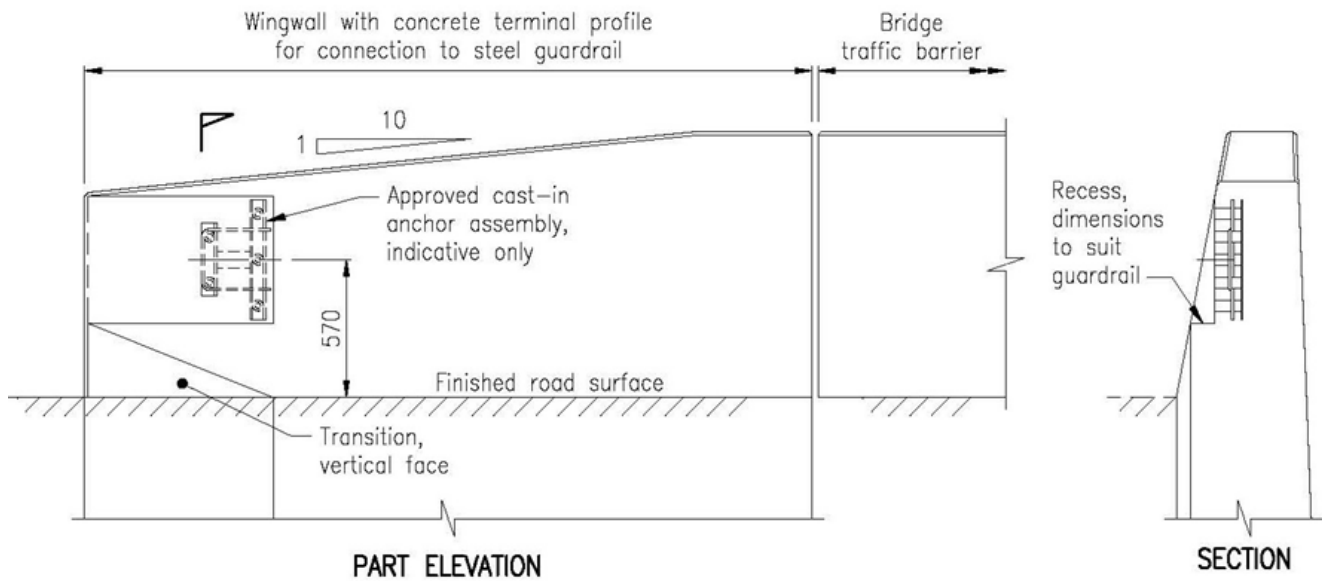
Example of wing wall connection to extruded barrier
